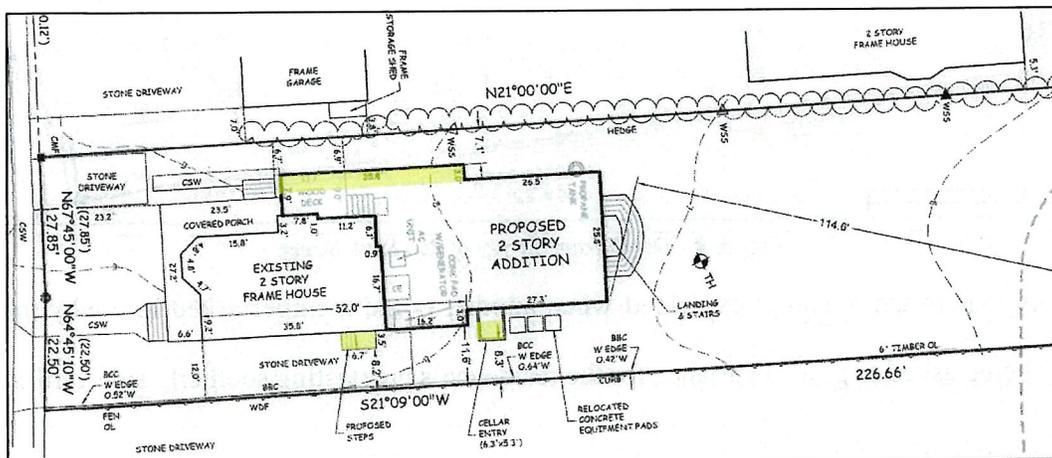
Application of 174 Street. Detail from Young Associates Surve, dated last revised September 19, 2025. Highlighted areas are the portions of the addition that are nonconforming.
